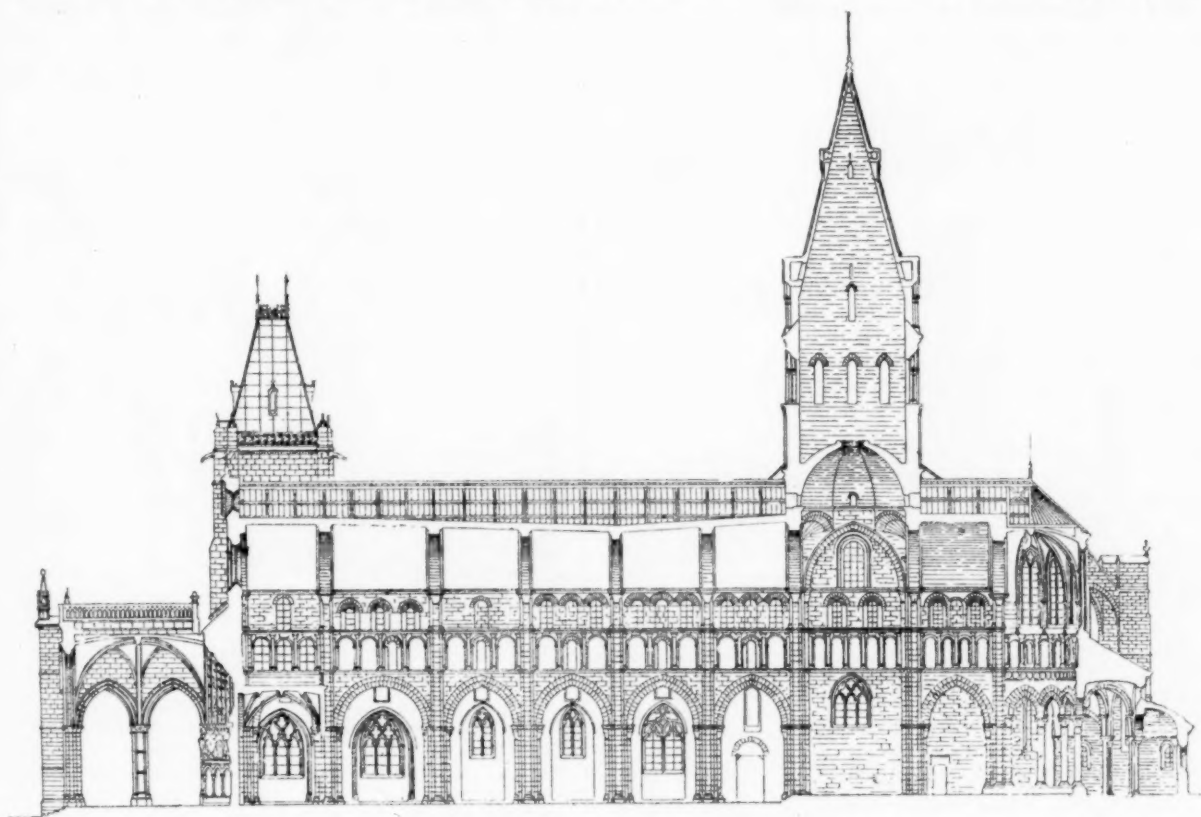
Longitudinal Section of Notre-Dame at Beaune.
